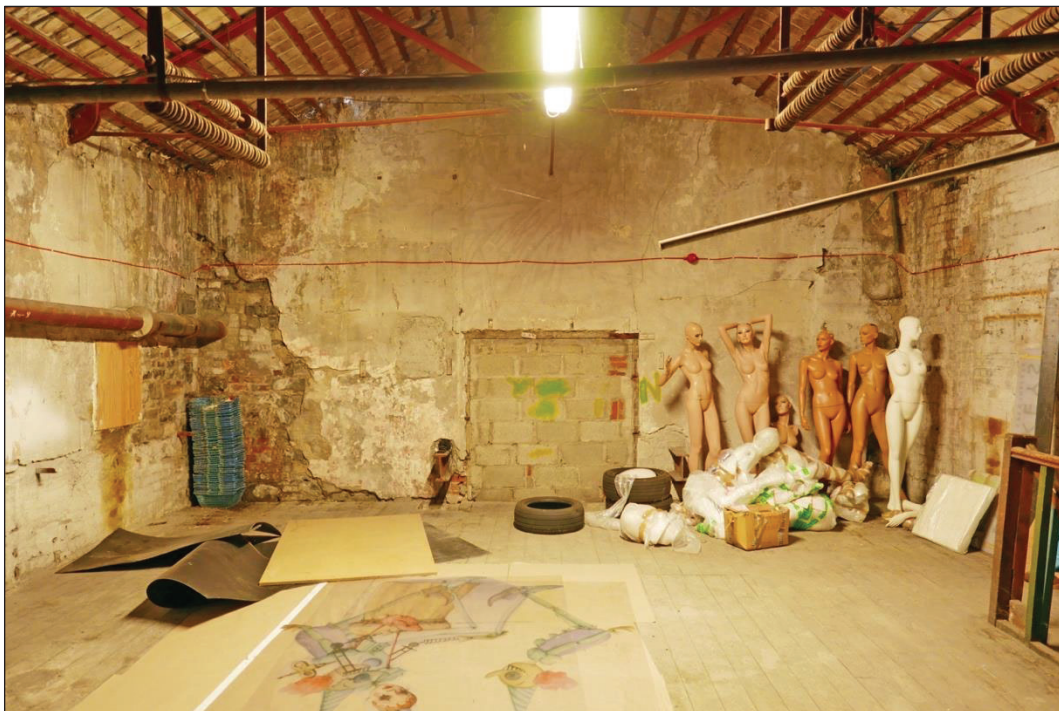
Interior of the first floor of the Smaller Gabled Industrial Buildings on the River Front
